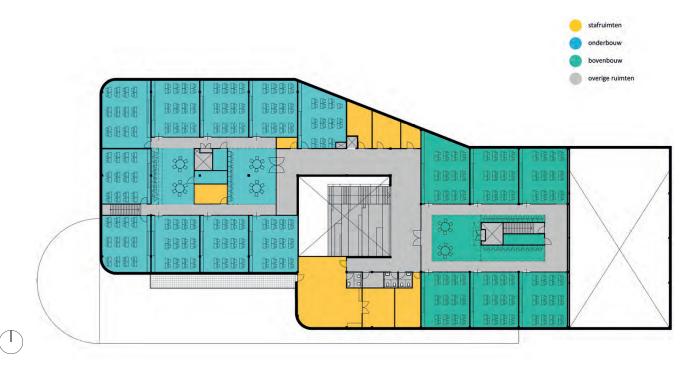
First floor plan indicating different activities. Source: KAW Architects
